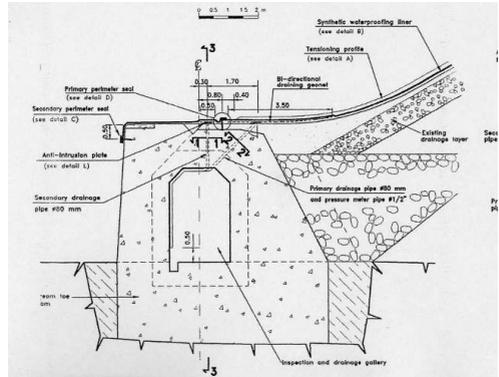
Moravka Bituminous Concrete Face Rockfill Dam, Czech Republic: the two bottom seals.
